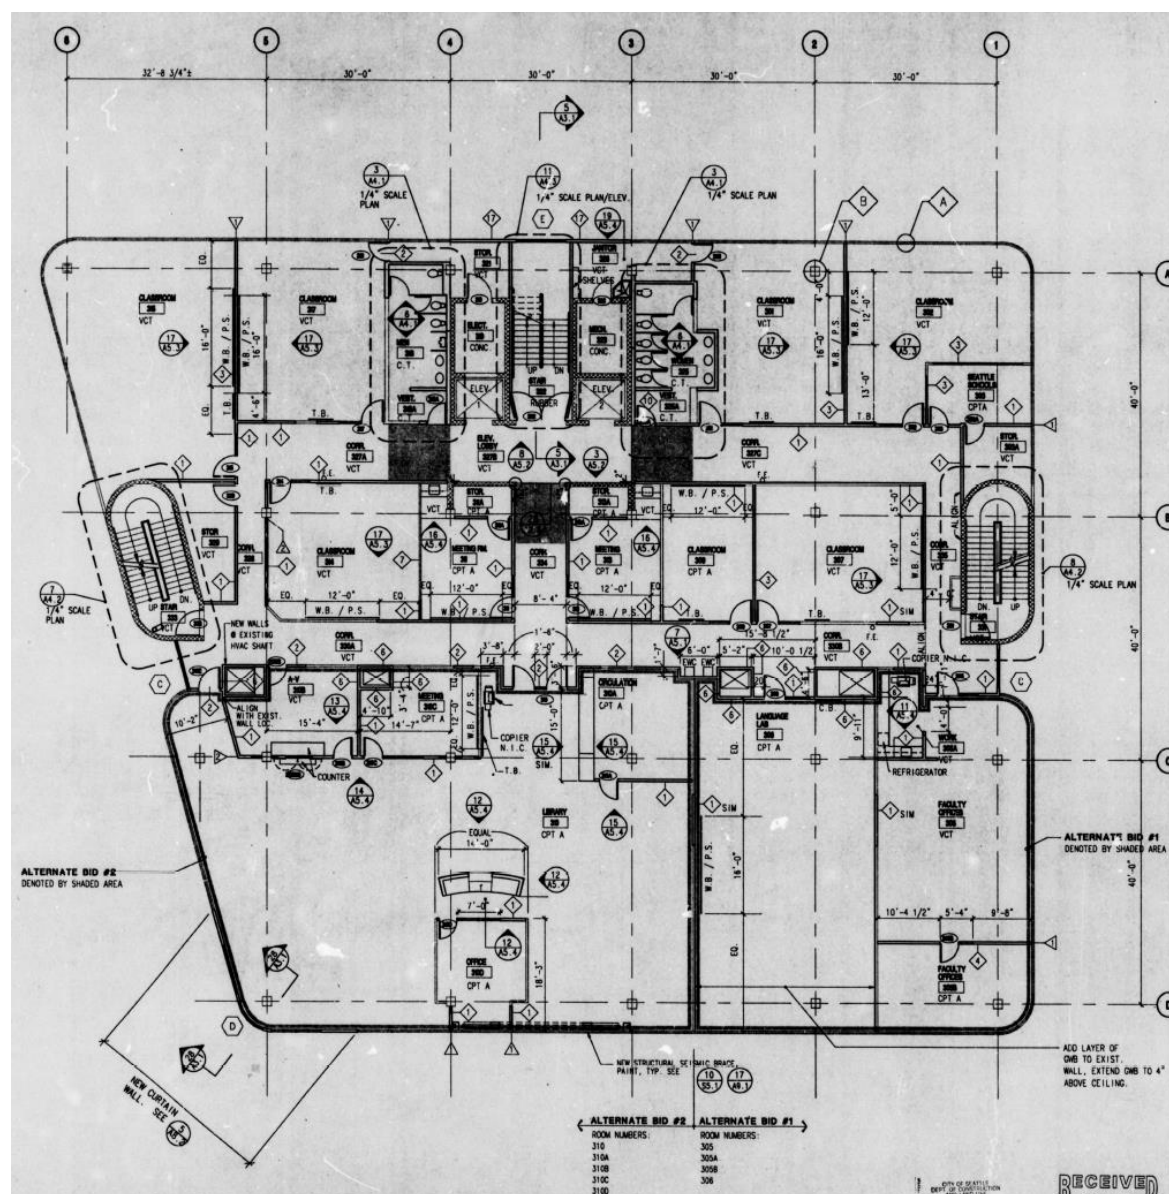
Third Floor Plan - 1996 Renovation, Johnson Architecture & Planning, 1995
